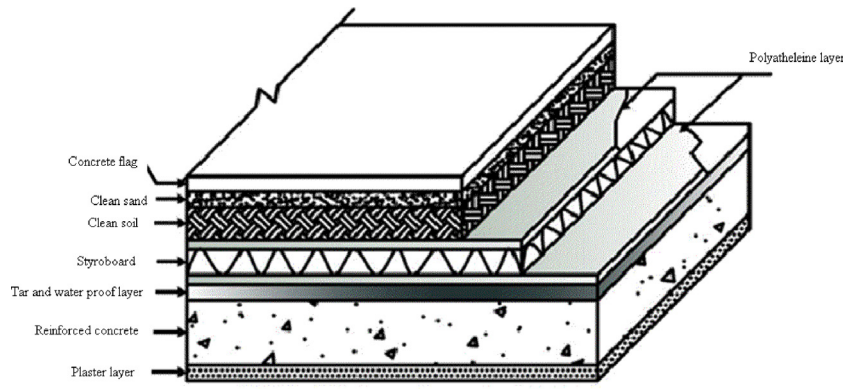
Typical reinforced concrete-based roof in Iraq [7].
